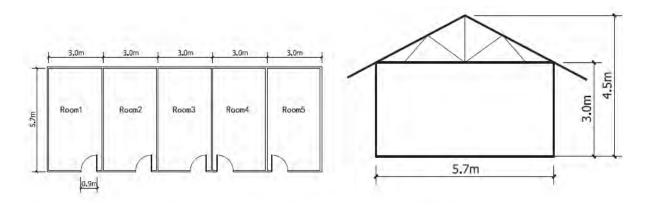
Floor plan and cross section of test building, from Peng et al. (2011)
